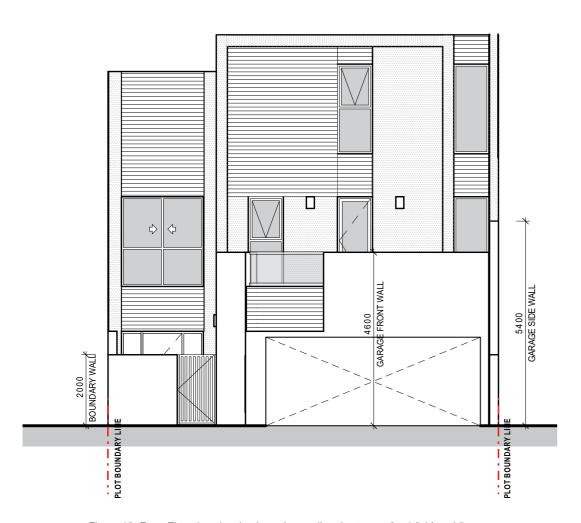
Front Elevation showing boundary wall and entrance for 4.3 / Aseel 2 $\,$
